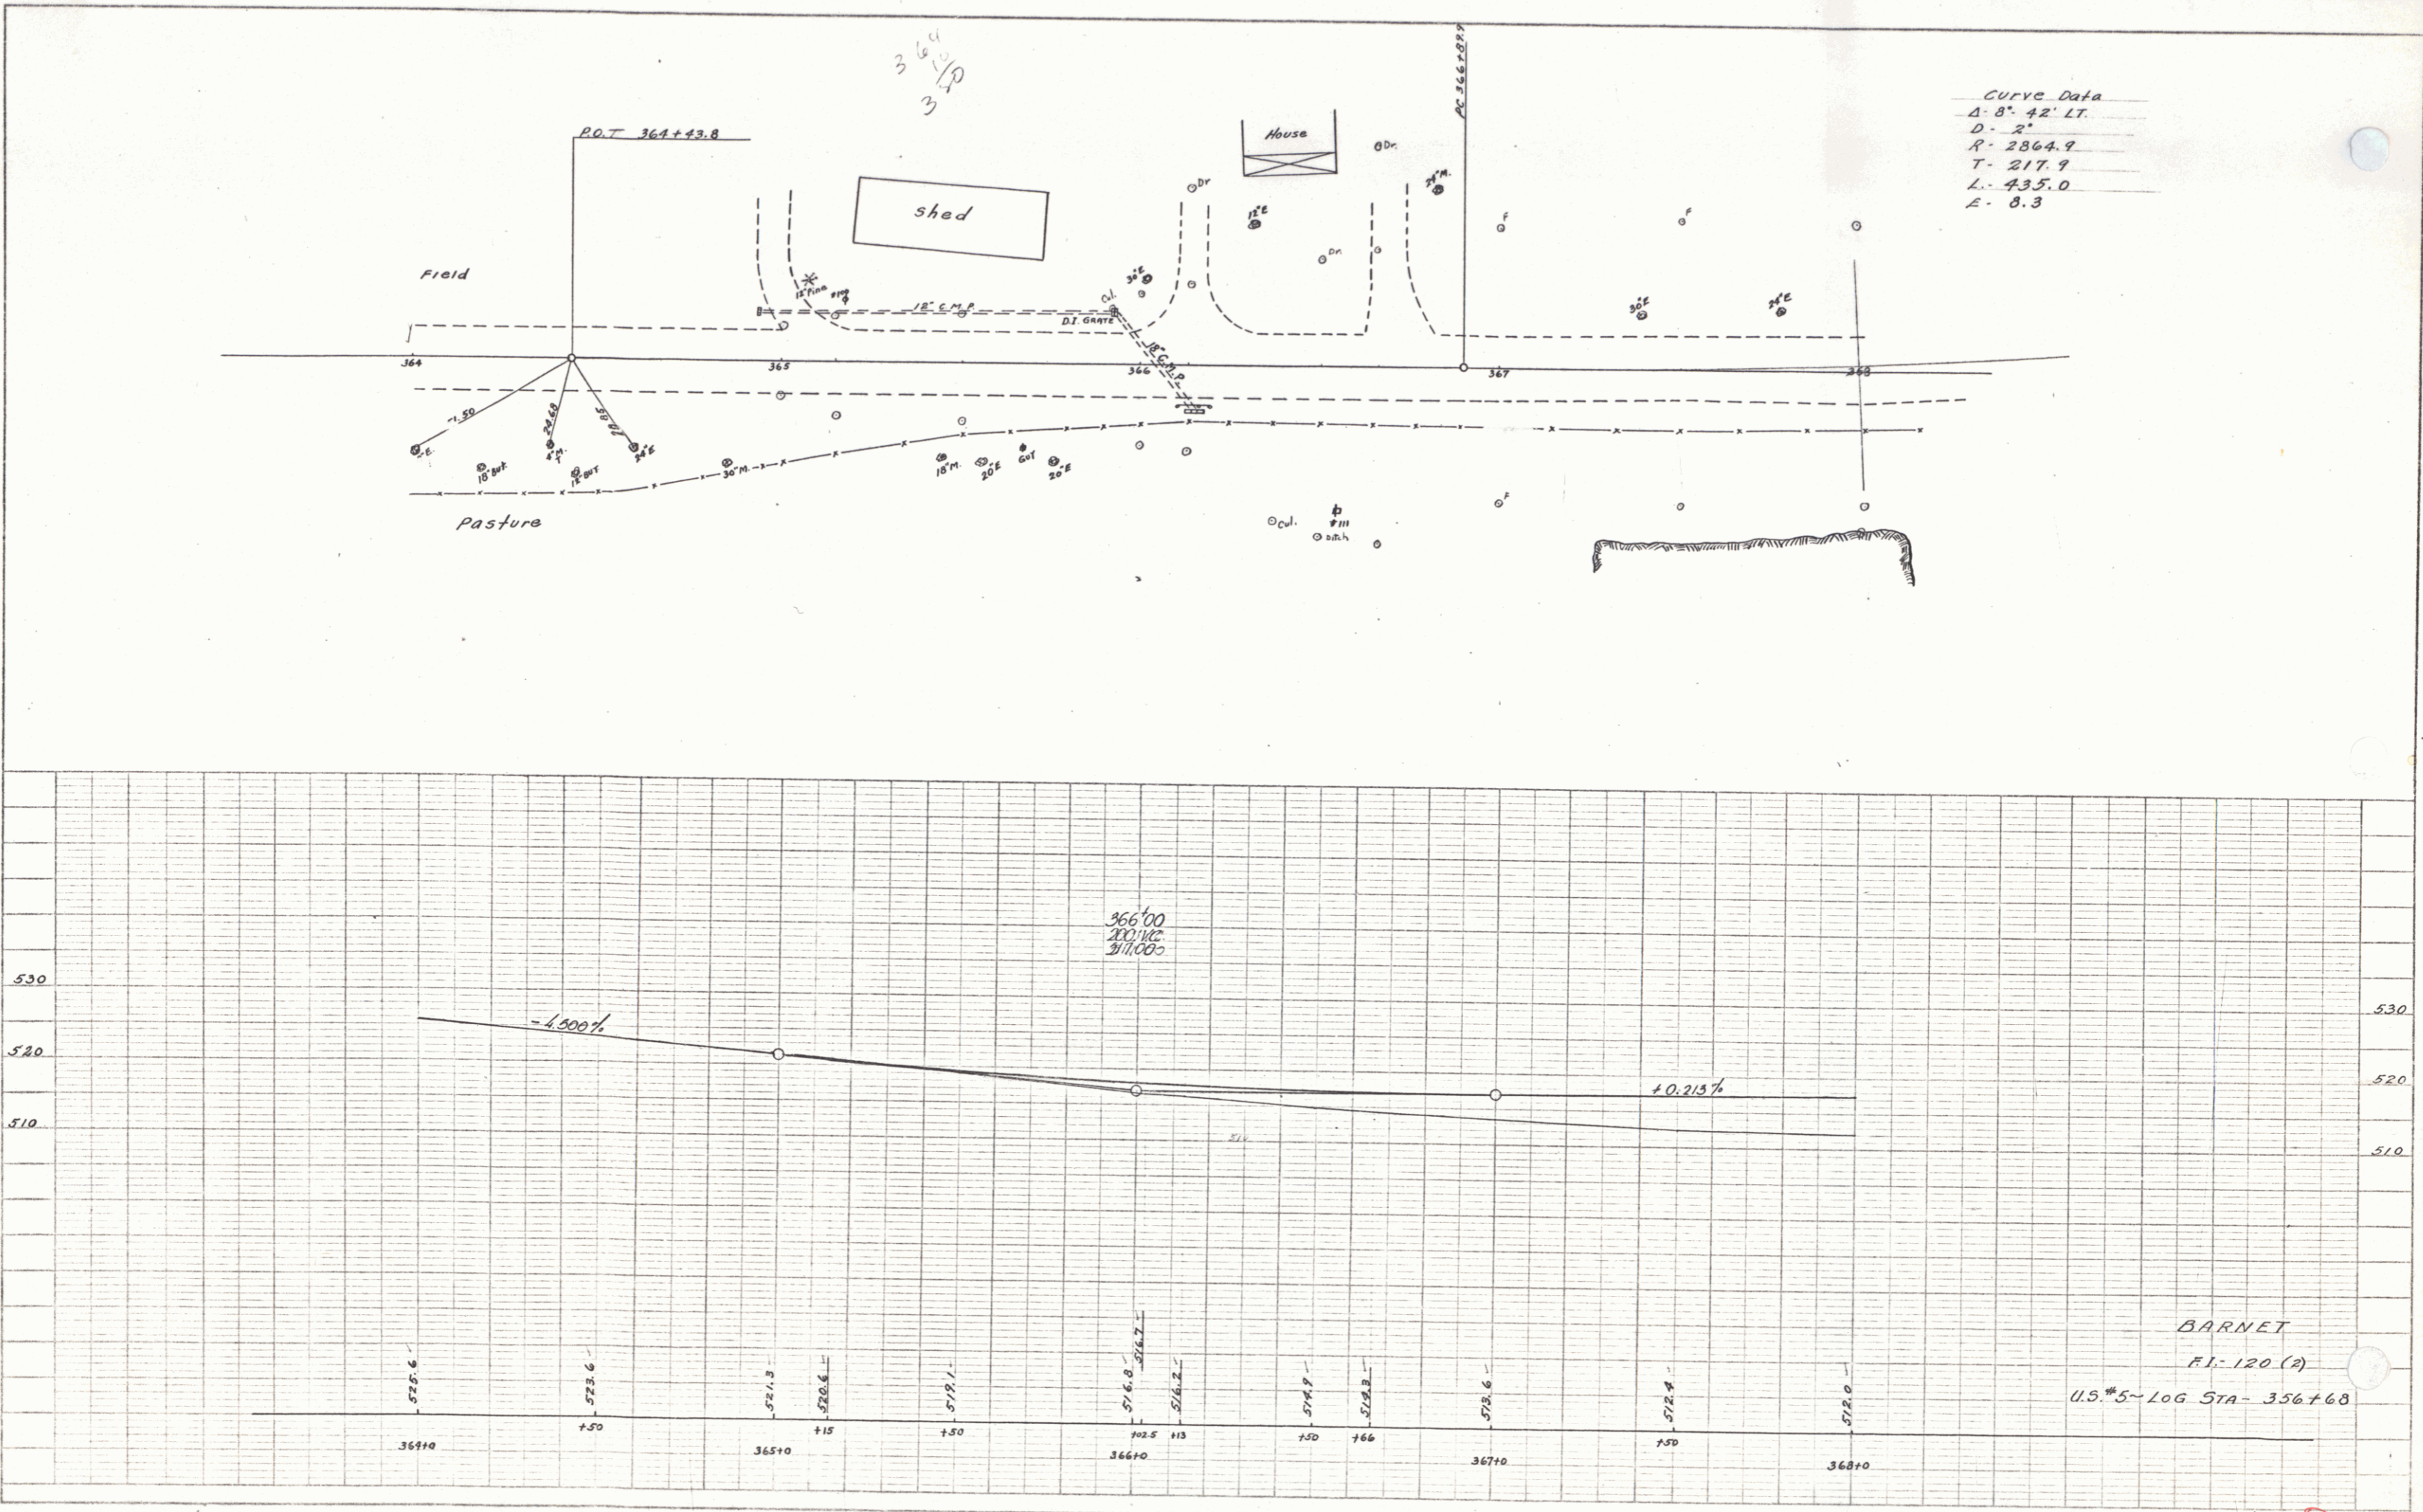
PLAN-PROFILE OF P.A. & R.R. STATION
